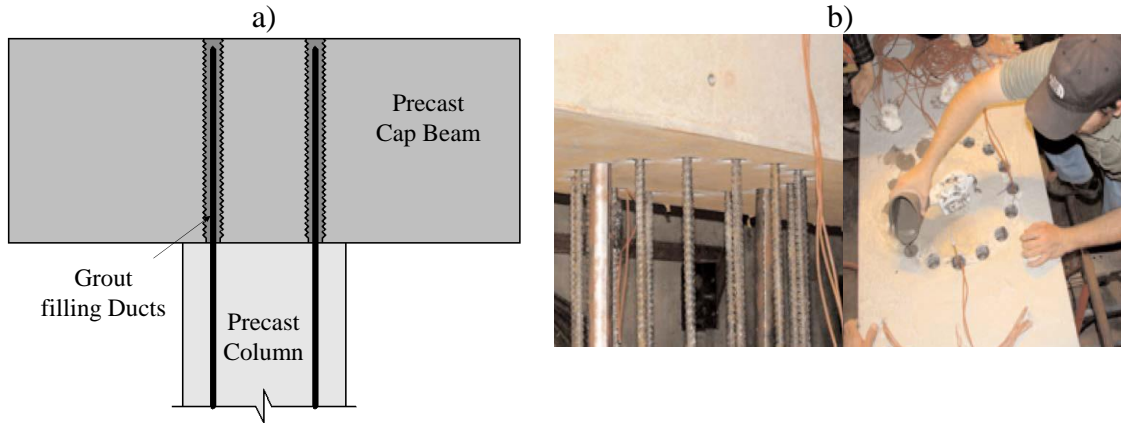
Grouted duct connection a) Schematic of the connection b) Cap placing and topping off ducts with grout [14].
